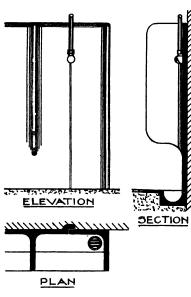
Stall slab urinal with lapped joint in centre of stall and divisions with coved angles.
